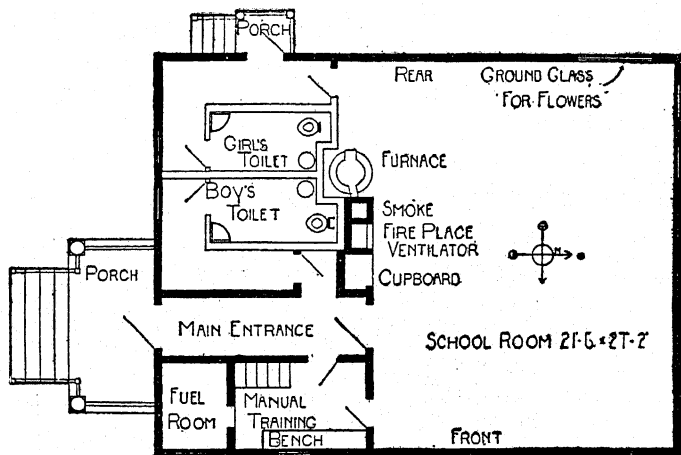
Floor plan of Kirksville model rural school. Indoor toilets can be added to any rural school, having a good water supply, at an extra cost of \$350.
